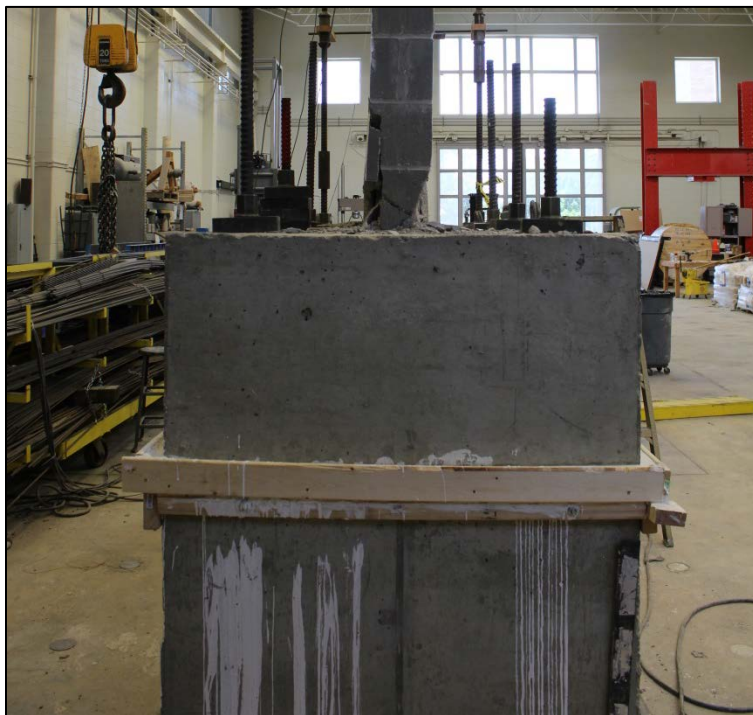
Fixing the footing and the prdestel to the floor with layer of hydroston between them
